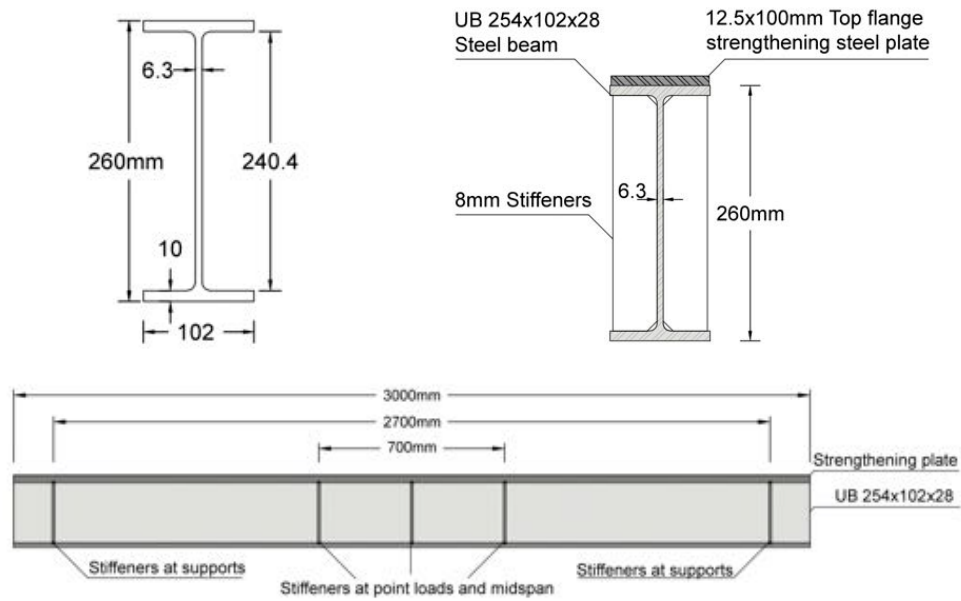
Cross-section nominal manufacturer's dimensions and stiffener locations for the un-strengthened test specimens
